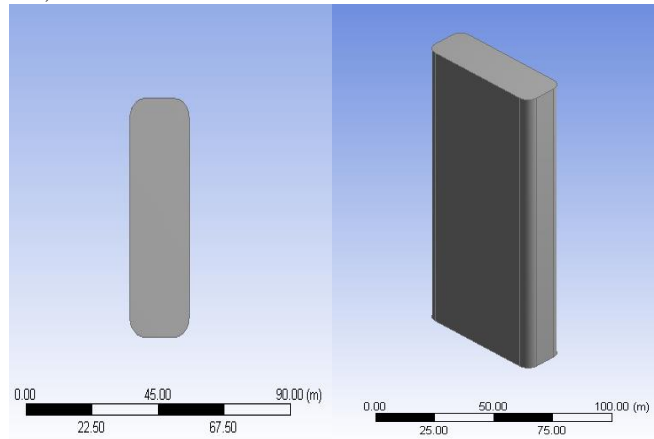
Plan and isometric view of rectangular model with rounded corner
